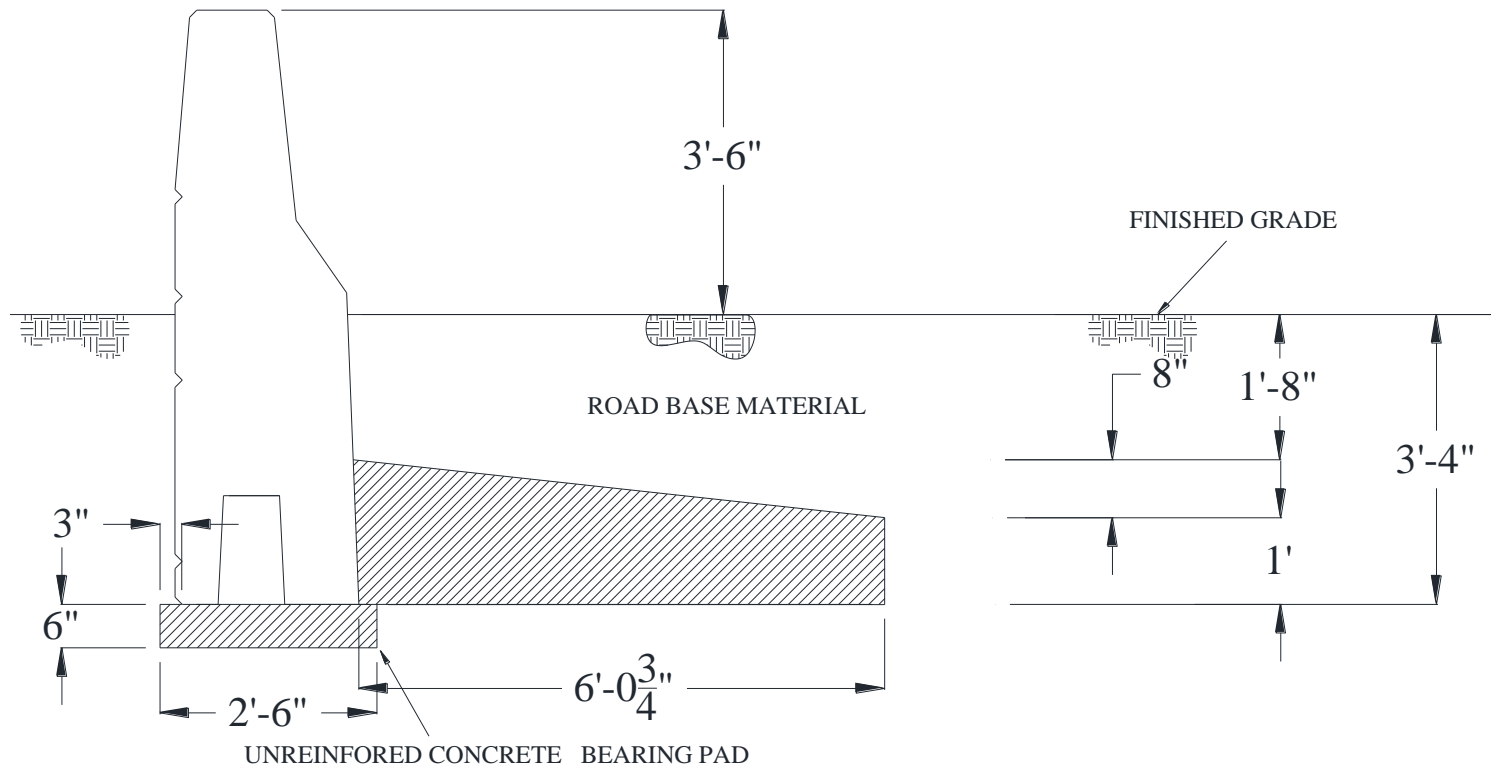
Side view of the TL-5 full-scale test installation (cross section B)
